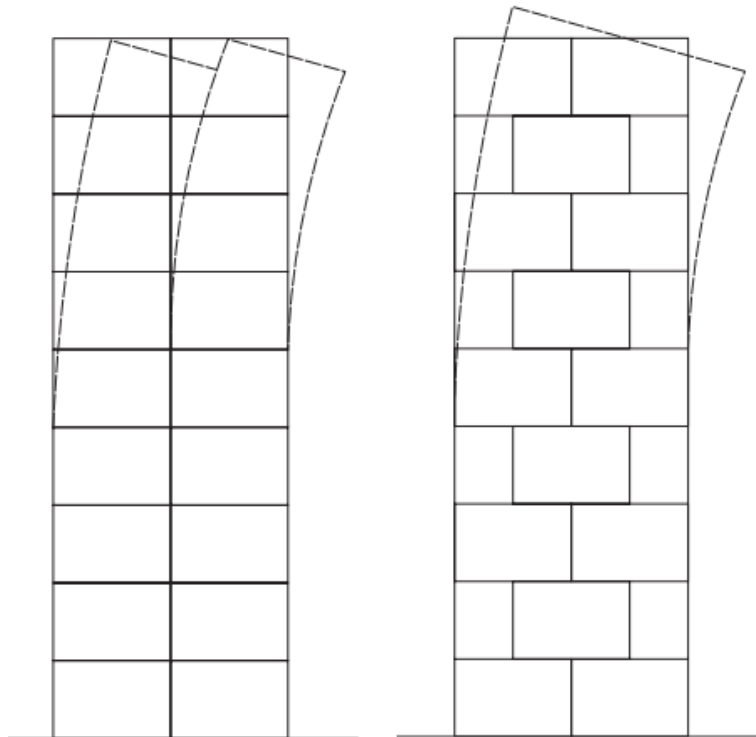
Element configuration at the Prinsenhof [Falger 2004]
